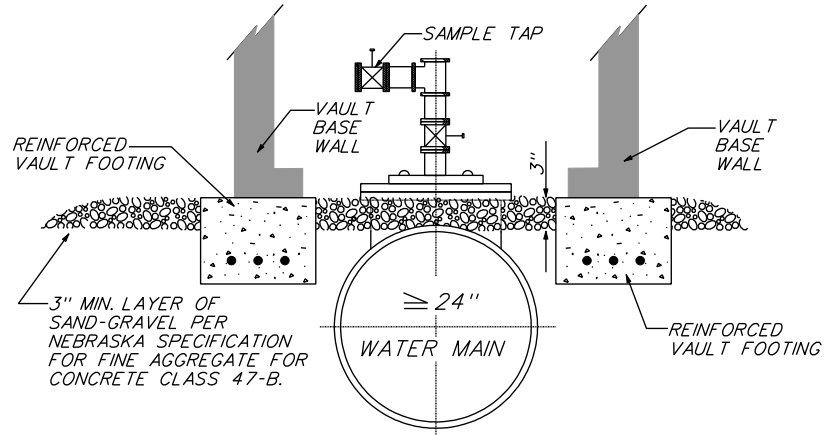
REINFORCED CONCRETE FOOTING DETAIL
